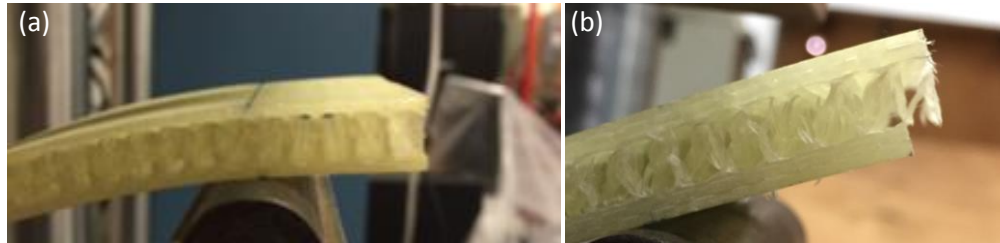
Core shear failure detail: (a) transverse; and (b) longitudinal.
